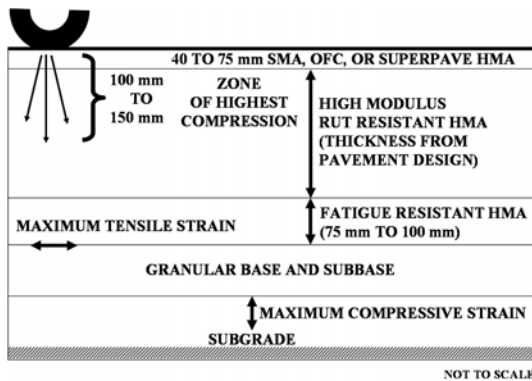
Schematic of a Long-Life Asphalt Pavement (Asphalt Pavement Alliance Perpetual Pavement) Showing the Renewable SMA, OFC, or Superpave Surface Course.
